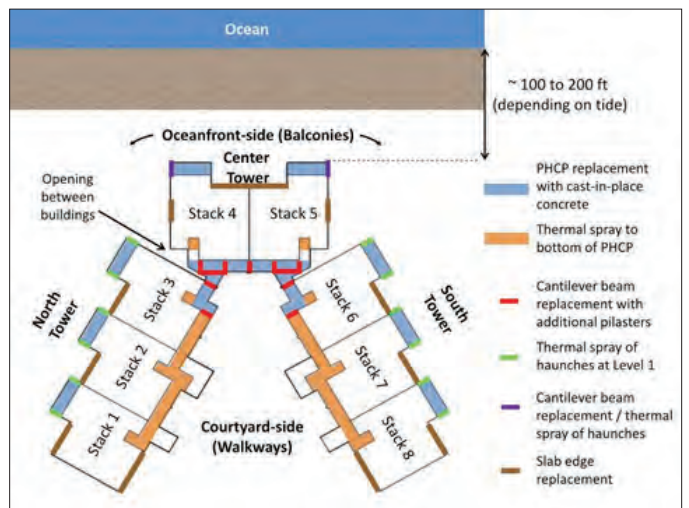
Schematic plan view of buildings showing proximity to ocean and general repair methodology
